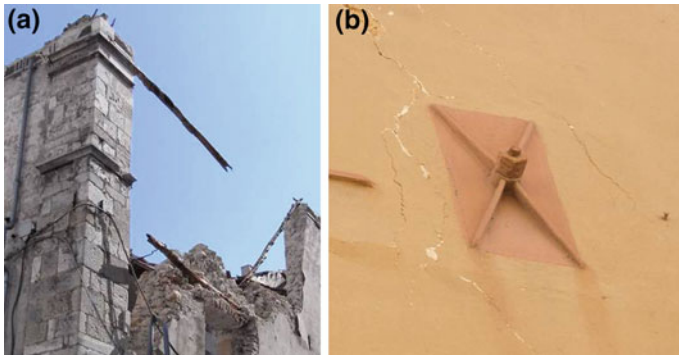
Examples of failed steel cross-ties: a material failure by tension of a timber tie; b punching shear failure of the anchor plate through the masonry wall
